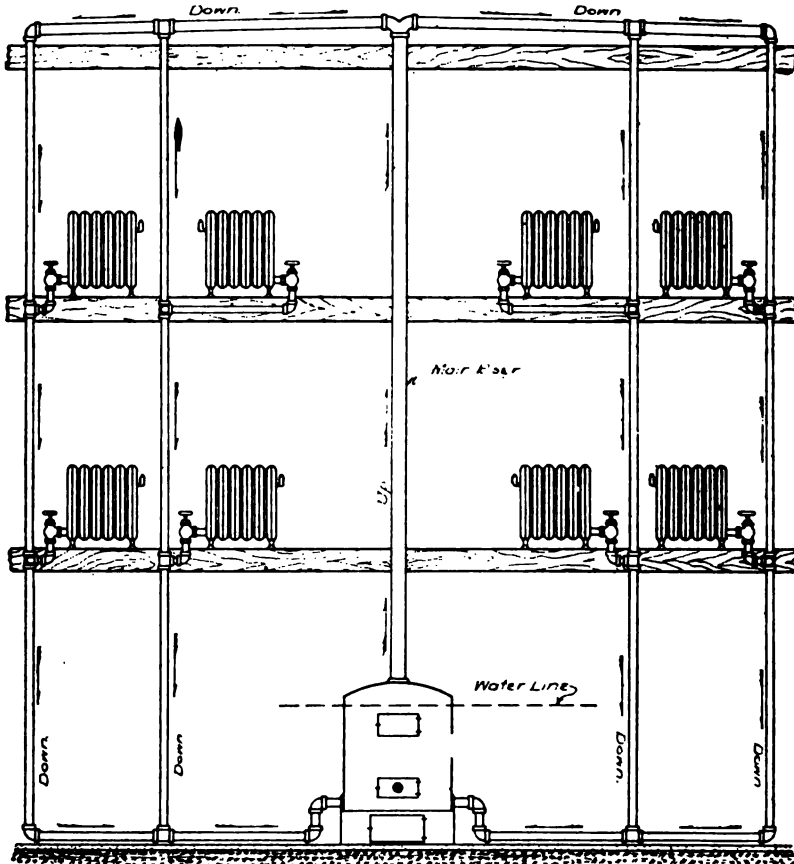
The Overhead or "Mills" System of Steam Heating.
